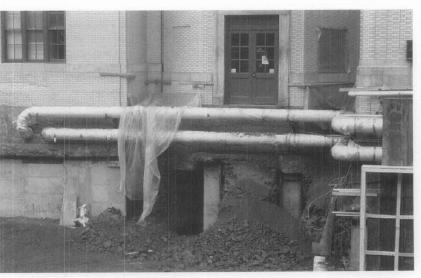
Concrete pier underpinning to an existing building may be necessary when adjacent construction occurs. In this example, pits are hand dug beneath the foundation of the historic building to provide space for wood forms. After concrete is poured into the forms, the space between the top of the pier and the bottom of the original foundation is packed with a quicksetting grout. The historic building owner should retain an independent engineer to ensure that the underpinning plan adequately protects the historic structure. Photo: Professor Arpad Horvath, Department of Civil and Environmental Engineering, University of California, Berkeley.
